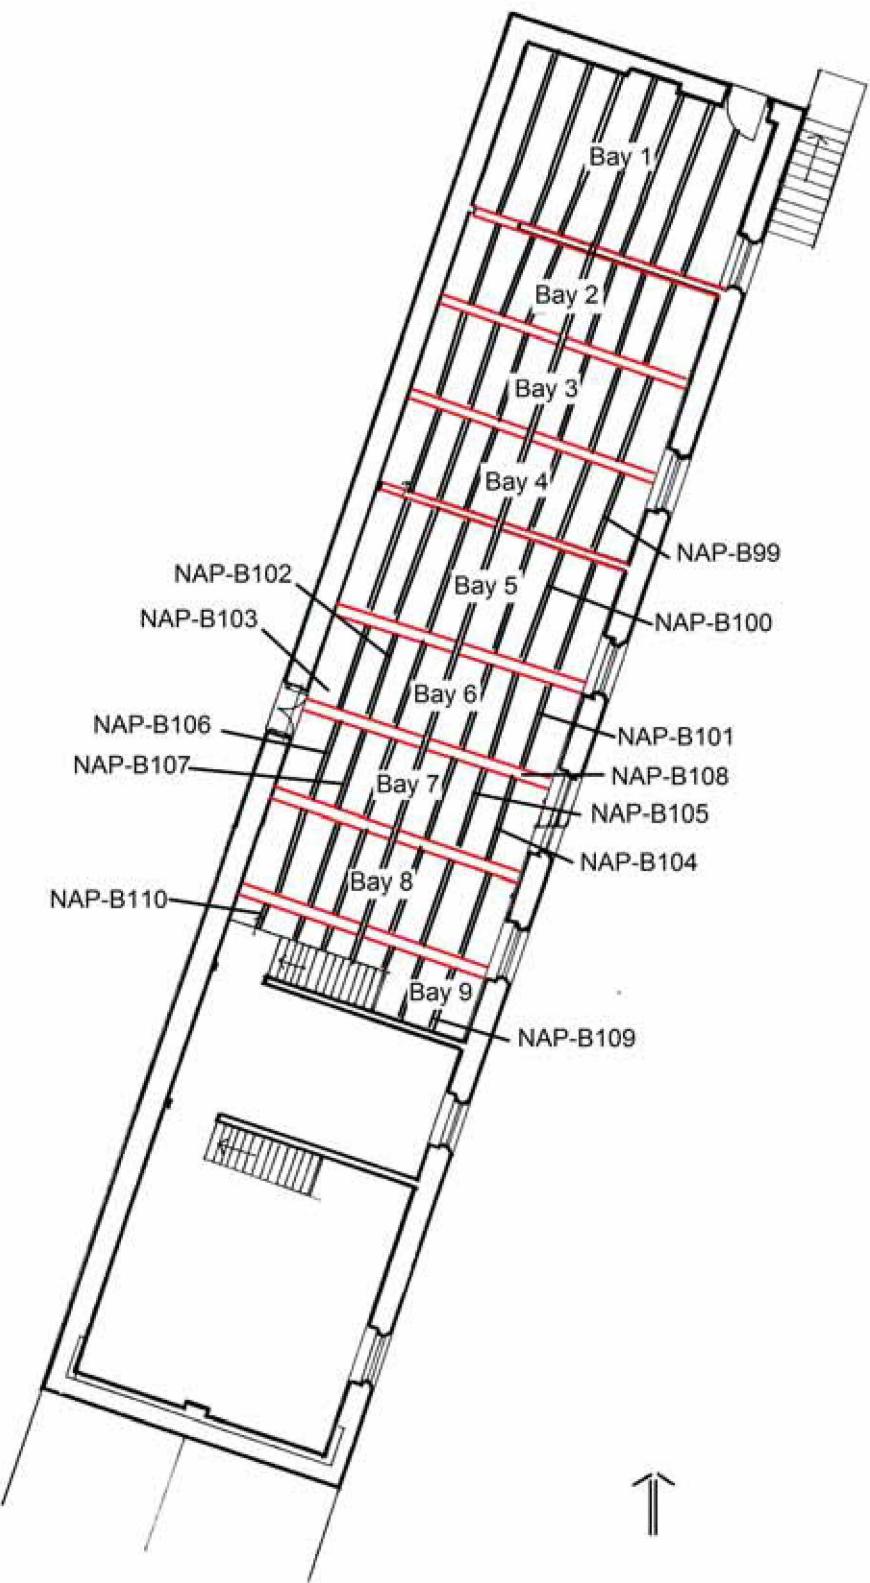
Stables/Coach-house range, first-floor plan showing the location of samples NAP-B99-110 (John Warren)
